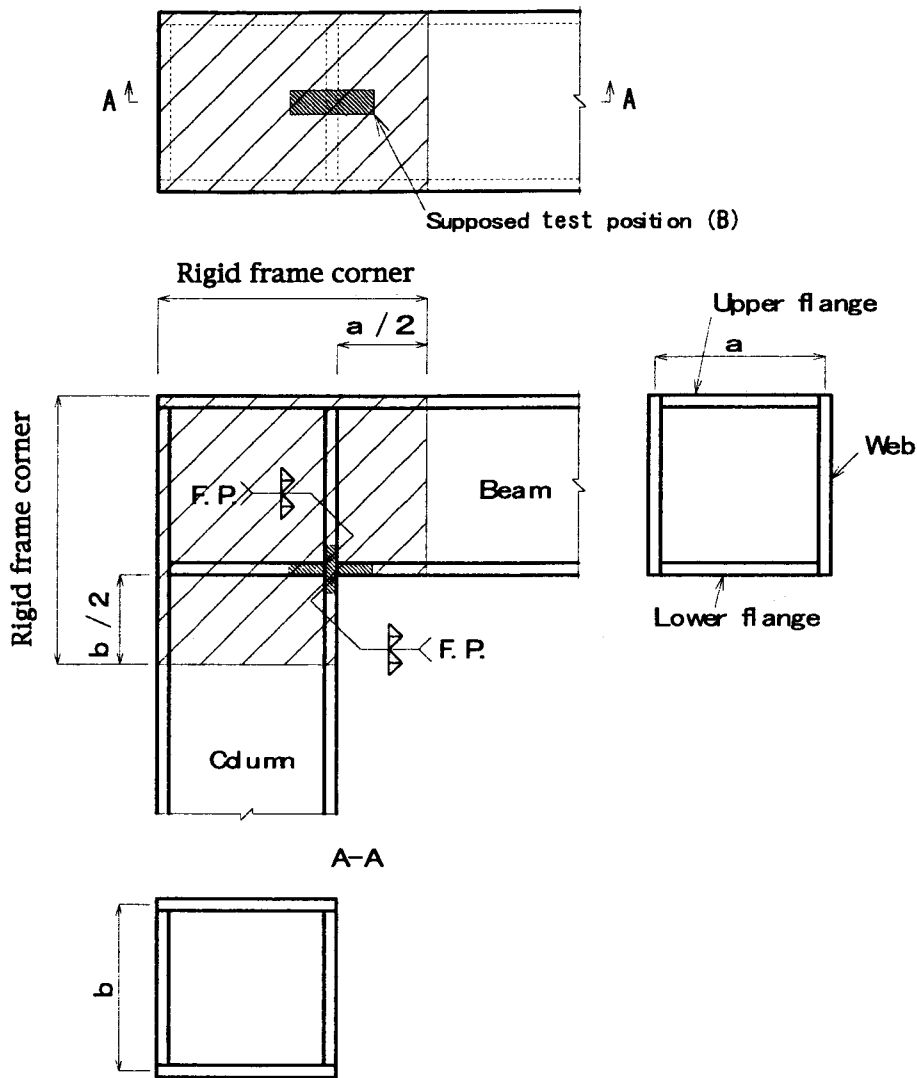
General view of beam to column connection of steel rigid frame pier and supposed position of cross-shaped test piece.
